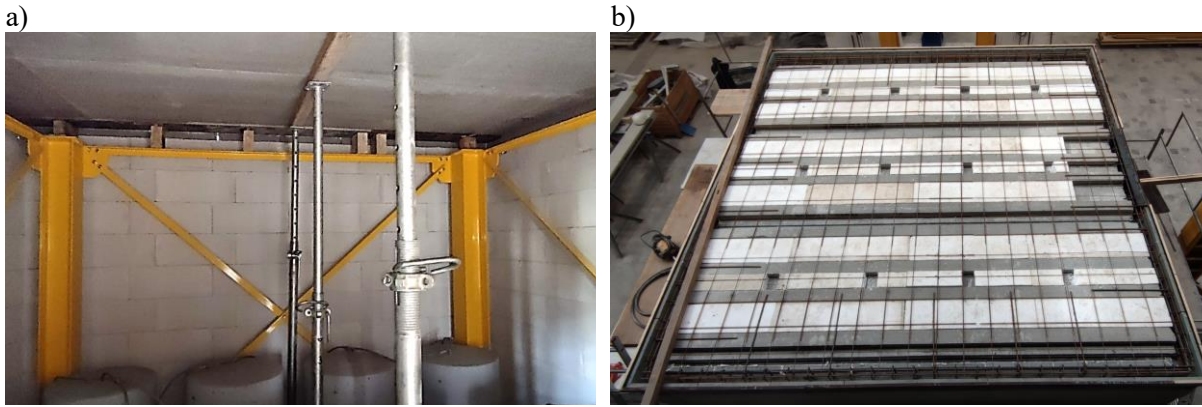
Preparation of the floor for concreting: a) formwork supports, b) top view on the ring formwork
